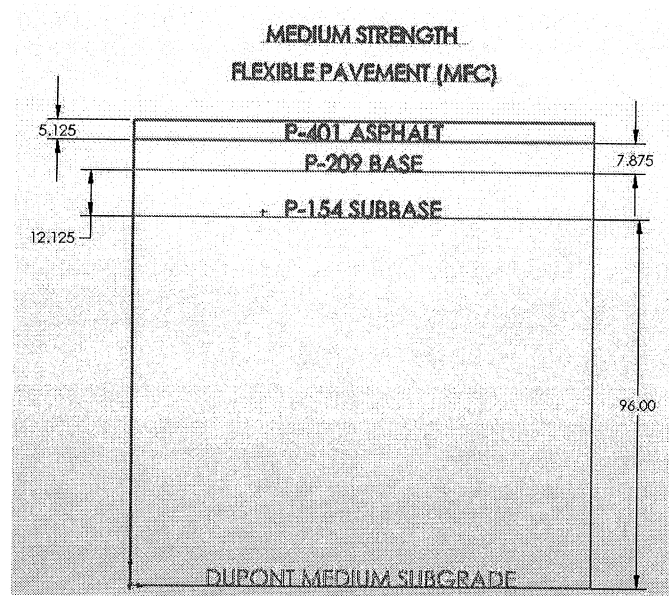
MFC Pavement Cross Section (dimensions in inches)
